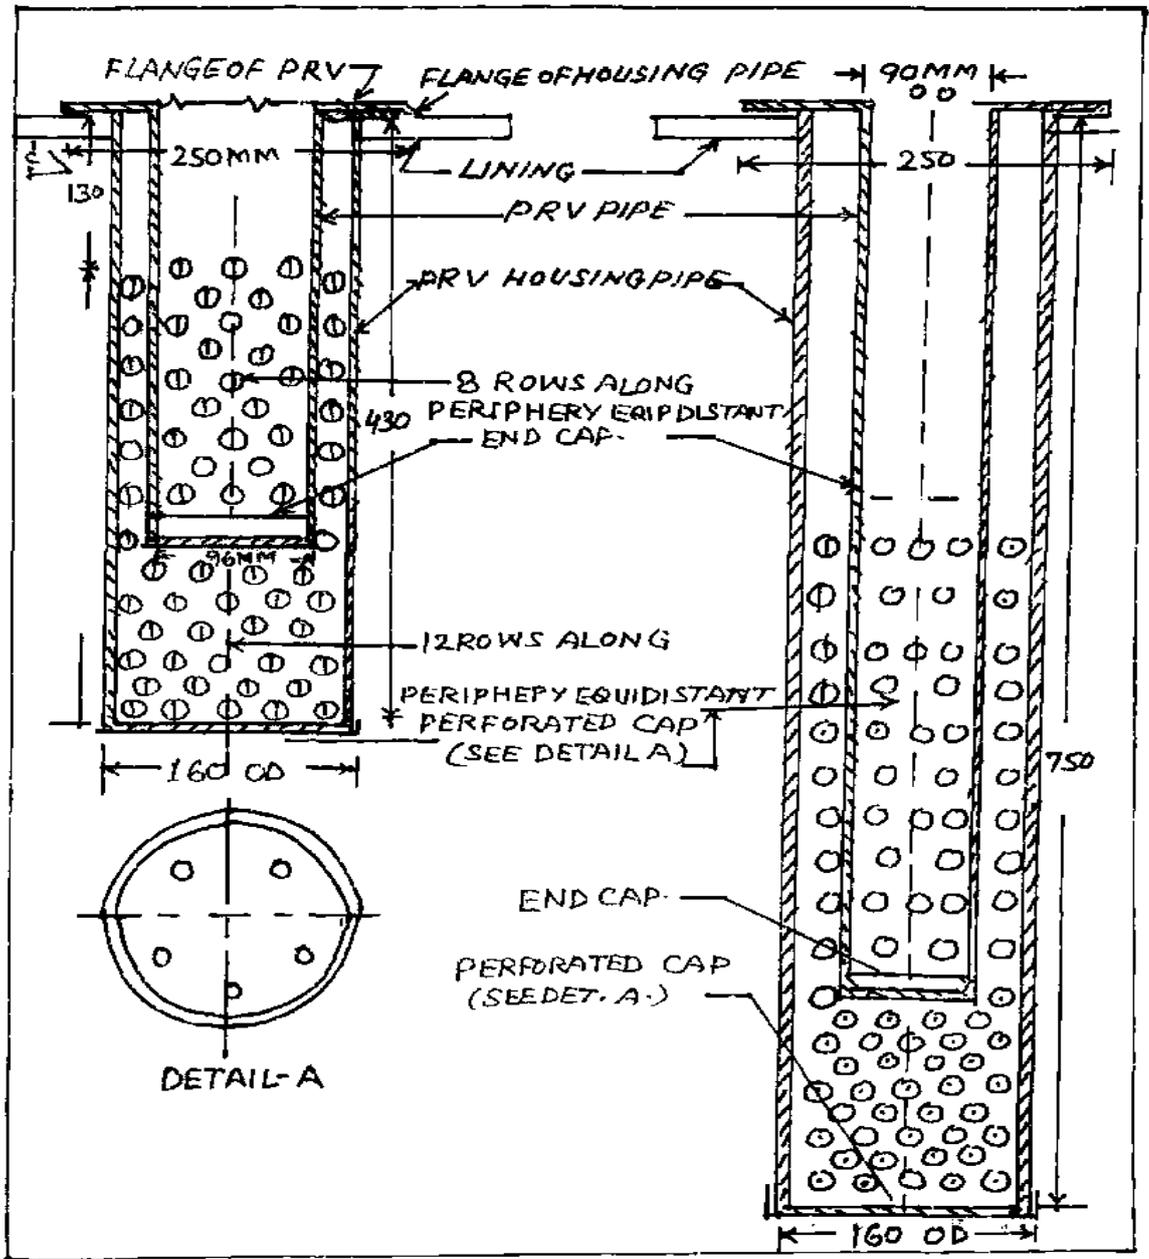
DETAIL OF PERFORATION IN DRY HOUSING PIPE
